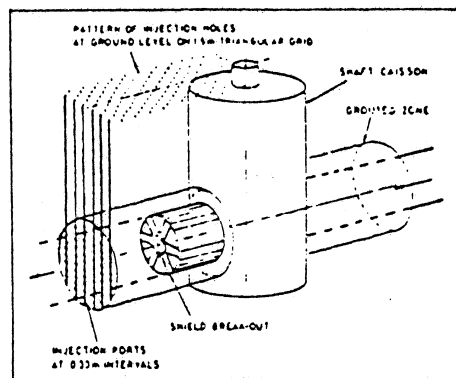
Typical Arrangement of Grout Zones and Injection Pipes, Contract 3, Cairo Wastewater Project (Greenwood et al., 1987).
